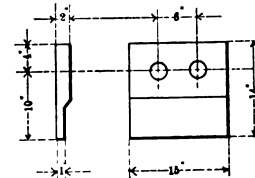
Plate for Truss Rod.—Scale, 1/4 Inch to the Foot.
